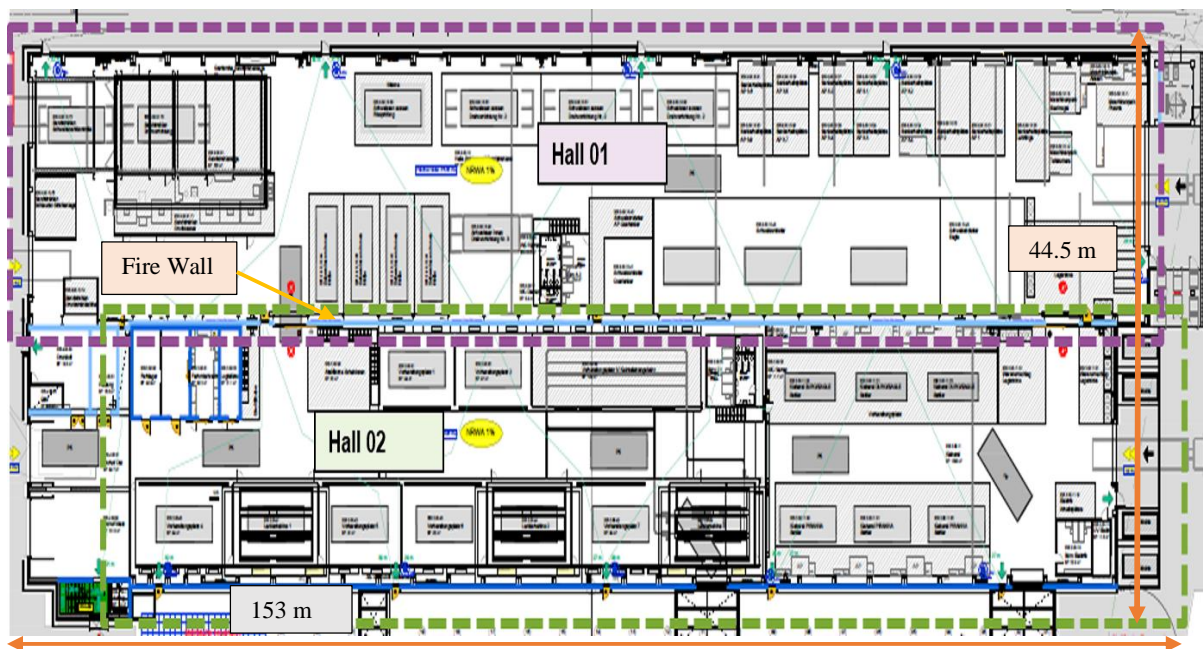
Plan view of the industrial building (Basler & Hofmann, 2017)
